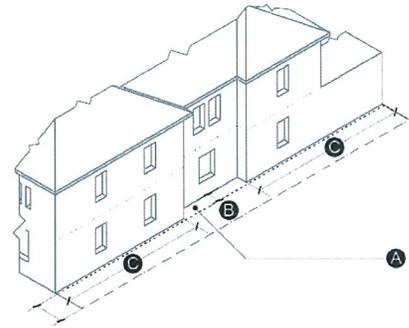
An additional side yard open space 'B' results in the modulation of side yard-facing building planes.
